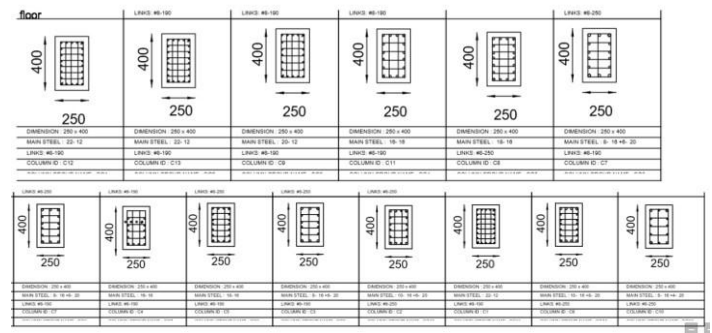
Columns detailed in AutoCAD (Cross section at ground floor)
